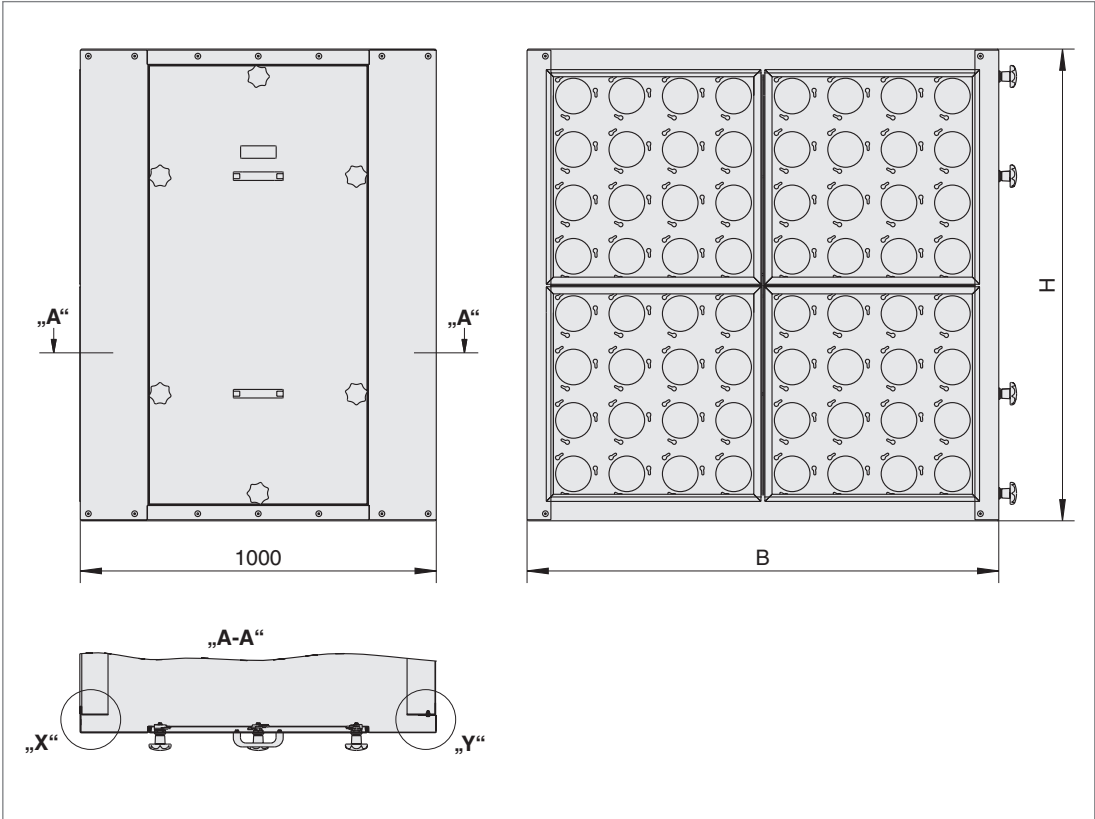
Universal casing for duct installation F341 (shown: service door on right)
